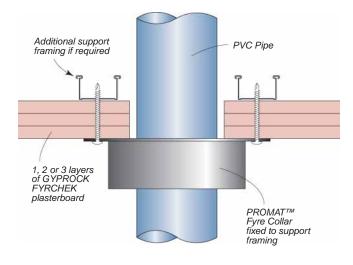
PVC PIPE PENETRATION THROUGH CEILING
